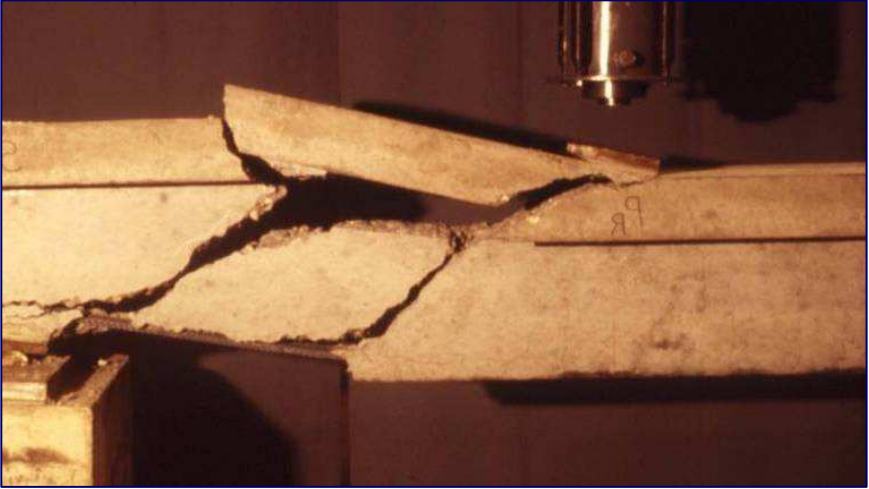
Shear failure of a concrete beam, without stirrups with T-shaped cross-section
